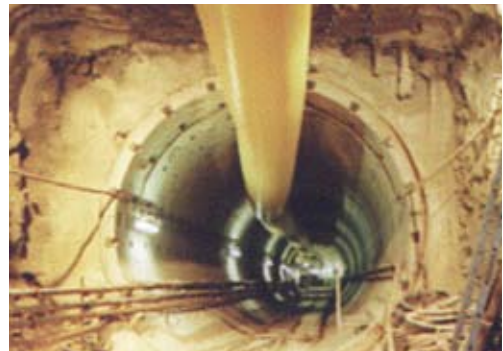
Metro of Genova tunnel excavation site.
